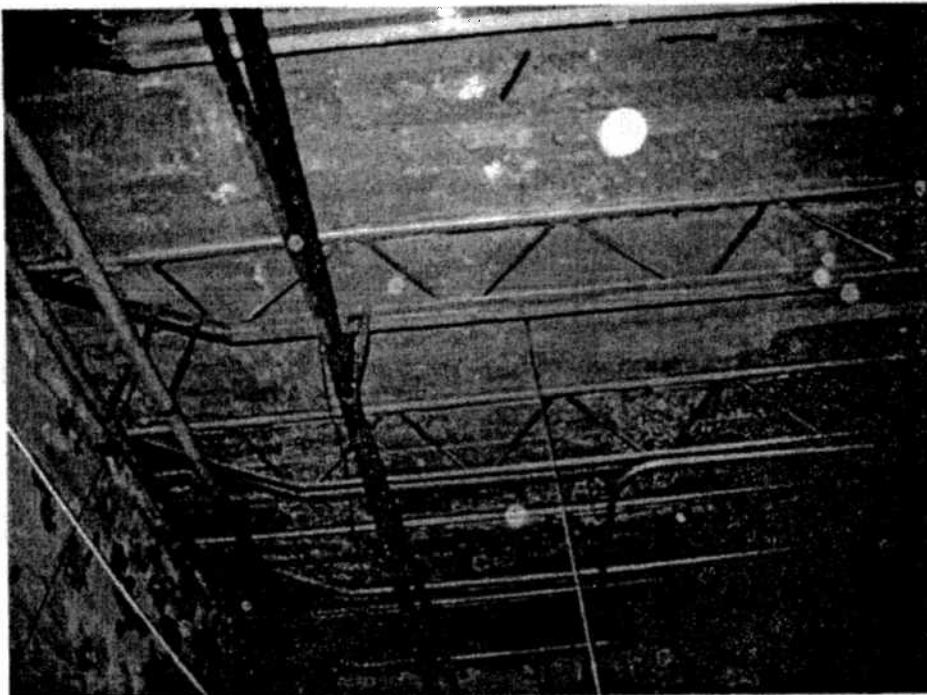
View above a drop ceiling in the office area noting typical construction and materials used in the Armory.
